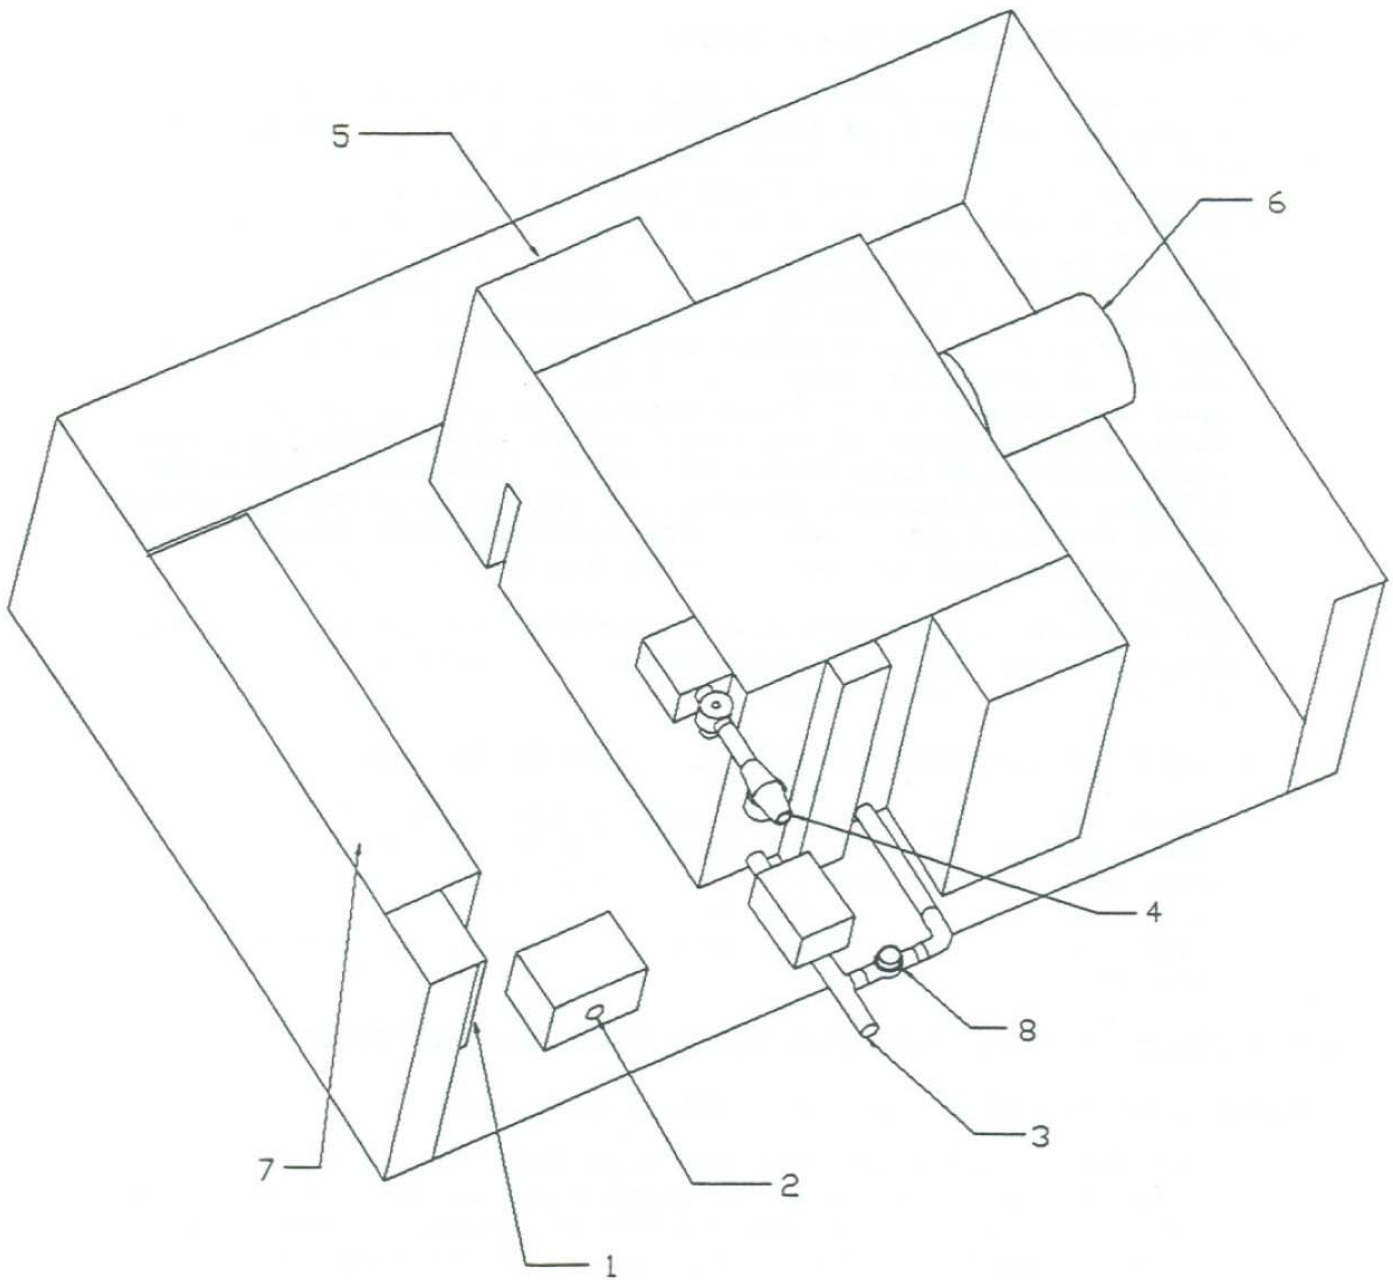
Typical Proofer, electrical service and plumbing utility connection points:
